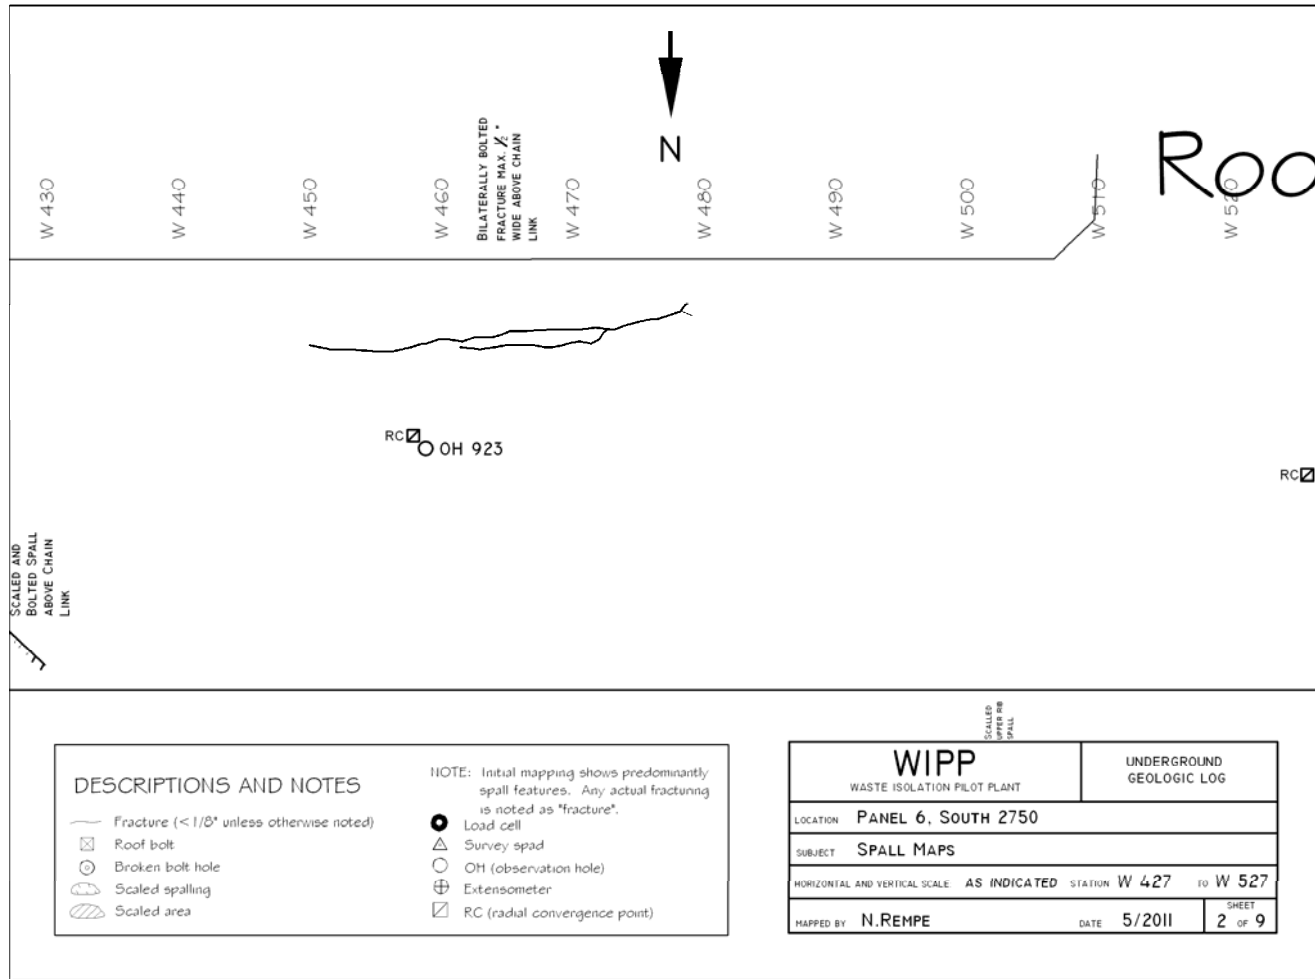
Panel 6 S2750, W390-W1210 Roof Fractures (Sheet 2 of 9)
